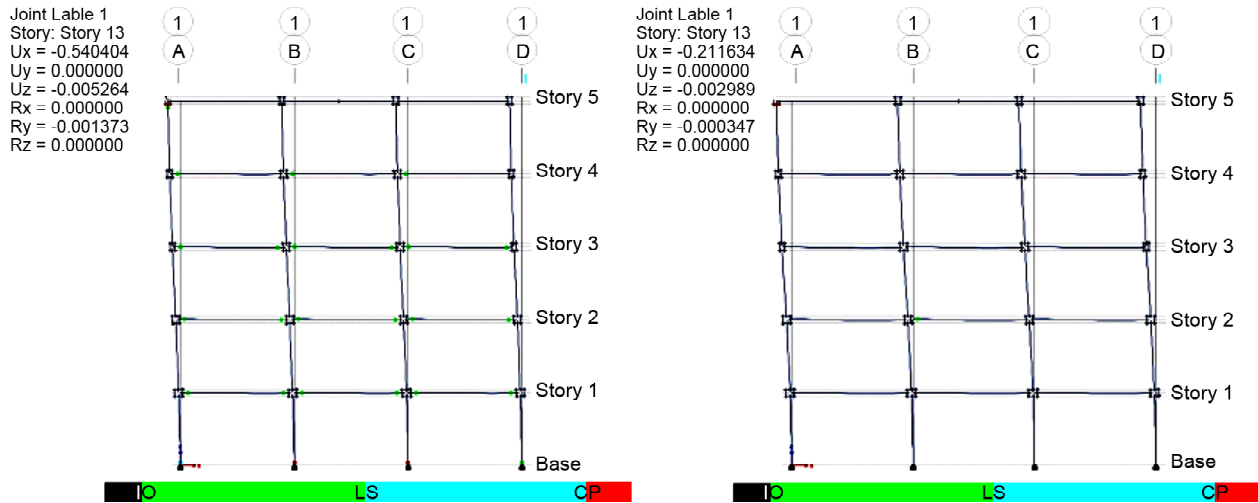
The first and last plastic joint in the structure by modeling the panel zone using the Krawinkler method.
